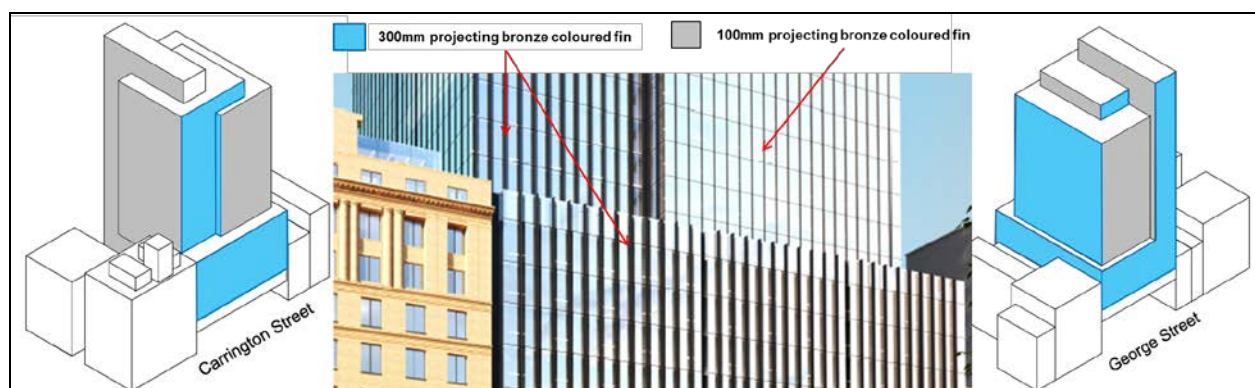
Architectural design of the George and Carrington Street tower elevations (Base source: applicant's EIS and RtS)
